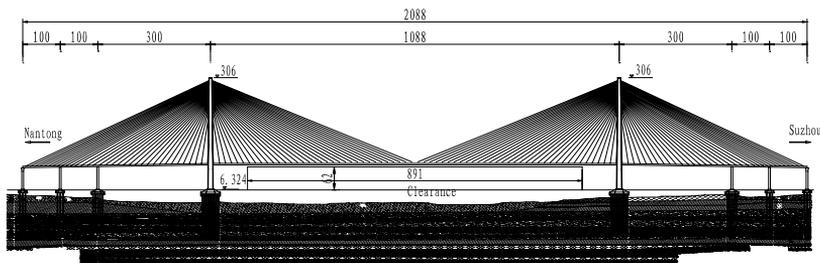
Span Arrangement of the Main Bridge (Unit: m)
